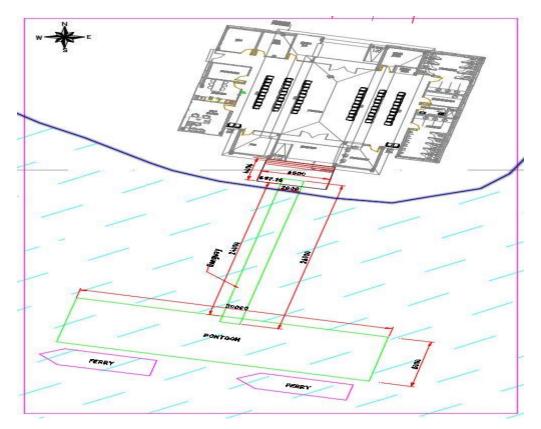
Overall site plan of proposed ferry terminal (T1) at Beechanahalli.
